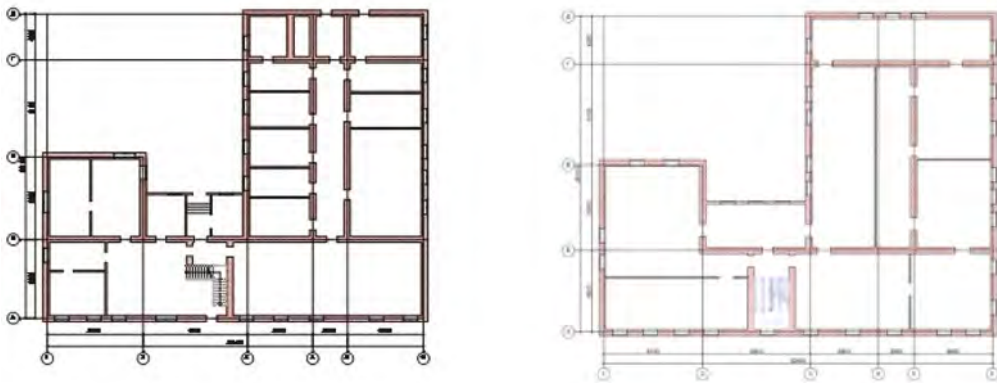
Arkel House, 1891. Plans of the 1st and 2nd floors, measurement of the building in 2016.
